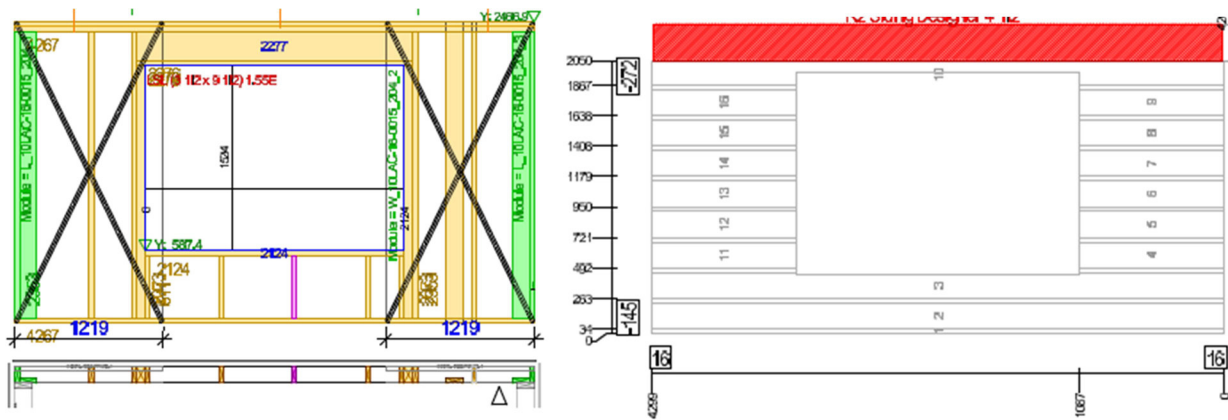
Sample shop drawing from panel 204 10LAC-16-0015.
